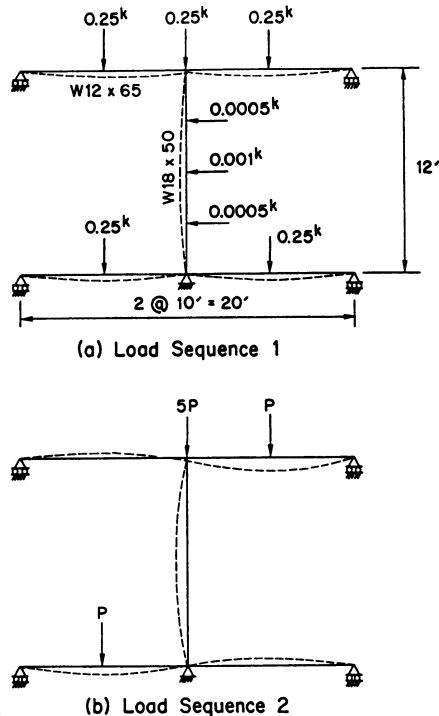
I-shaped subassemblage—connections with tangent stiffness restraint
